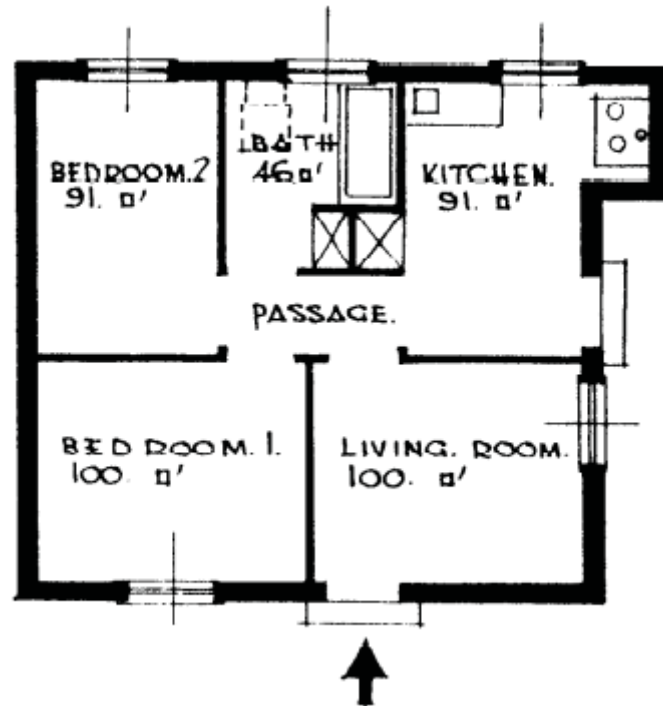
Type Plan Built in Sharpe Township, Vereeniging (Calderwood, 1953 p19-21)
